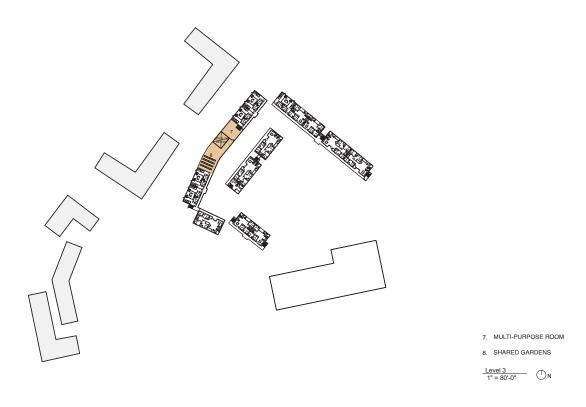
3rd level floor plan highlighting the second level of the common house. Source: Author
